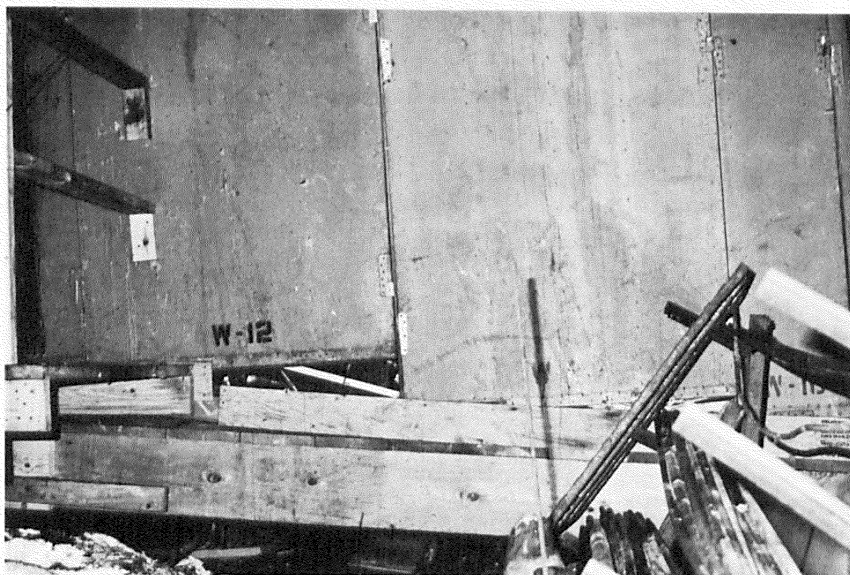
Interior view of Trench 19. Building which once occupied this trench was removed in 1965. Aluminum pipe along wall carried sewage to outfall pool at rear of trench.
